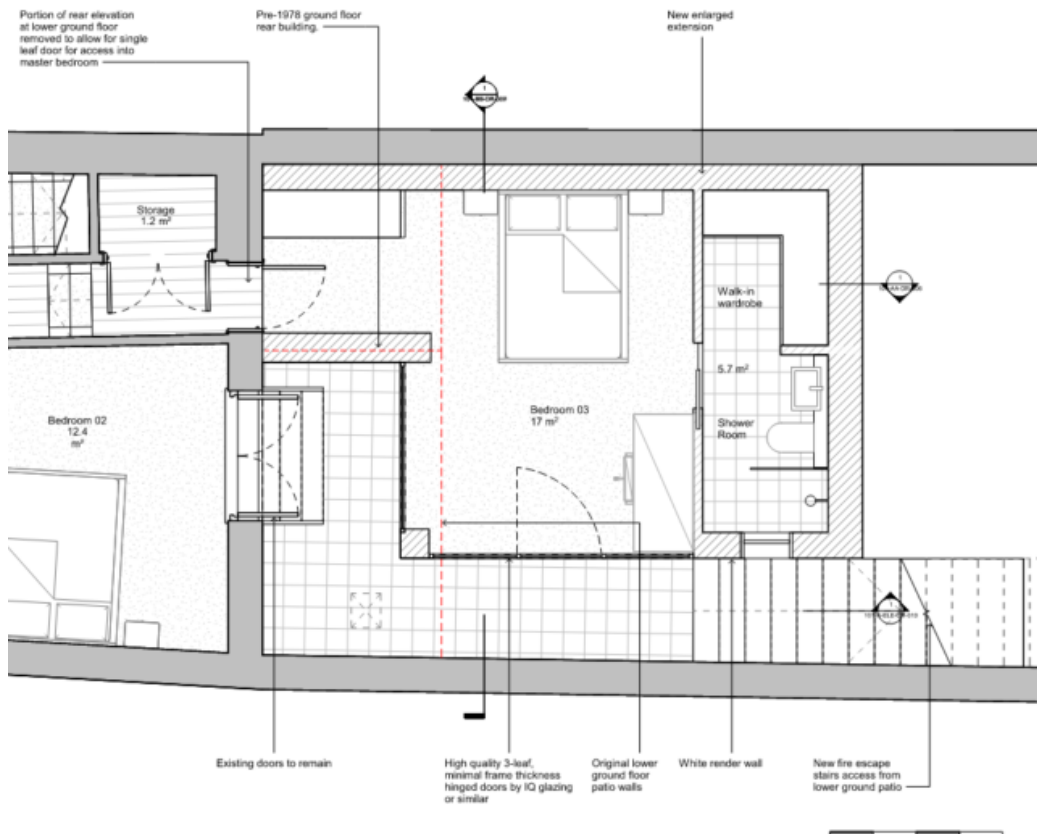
Inset of proposed lower ground floor plan, and the courtyard linking the existing rear elevation and staircase
